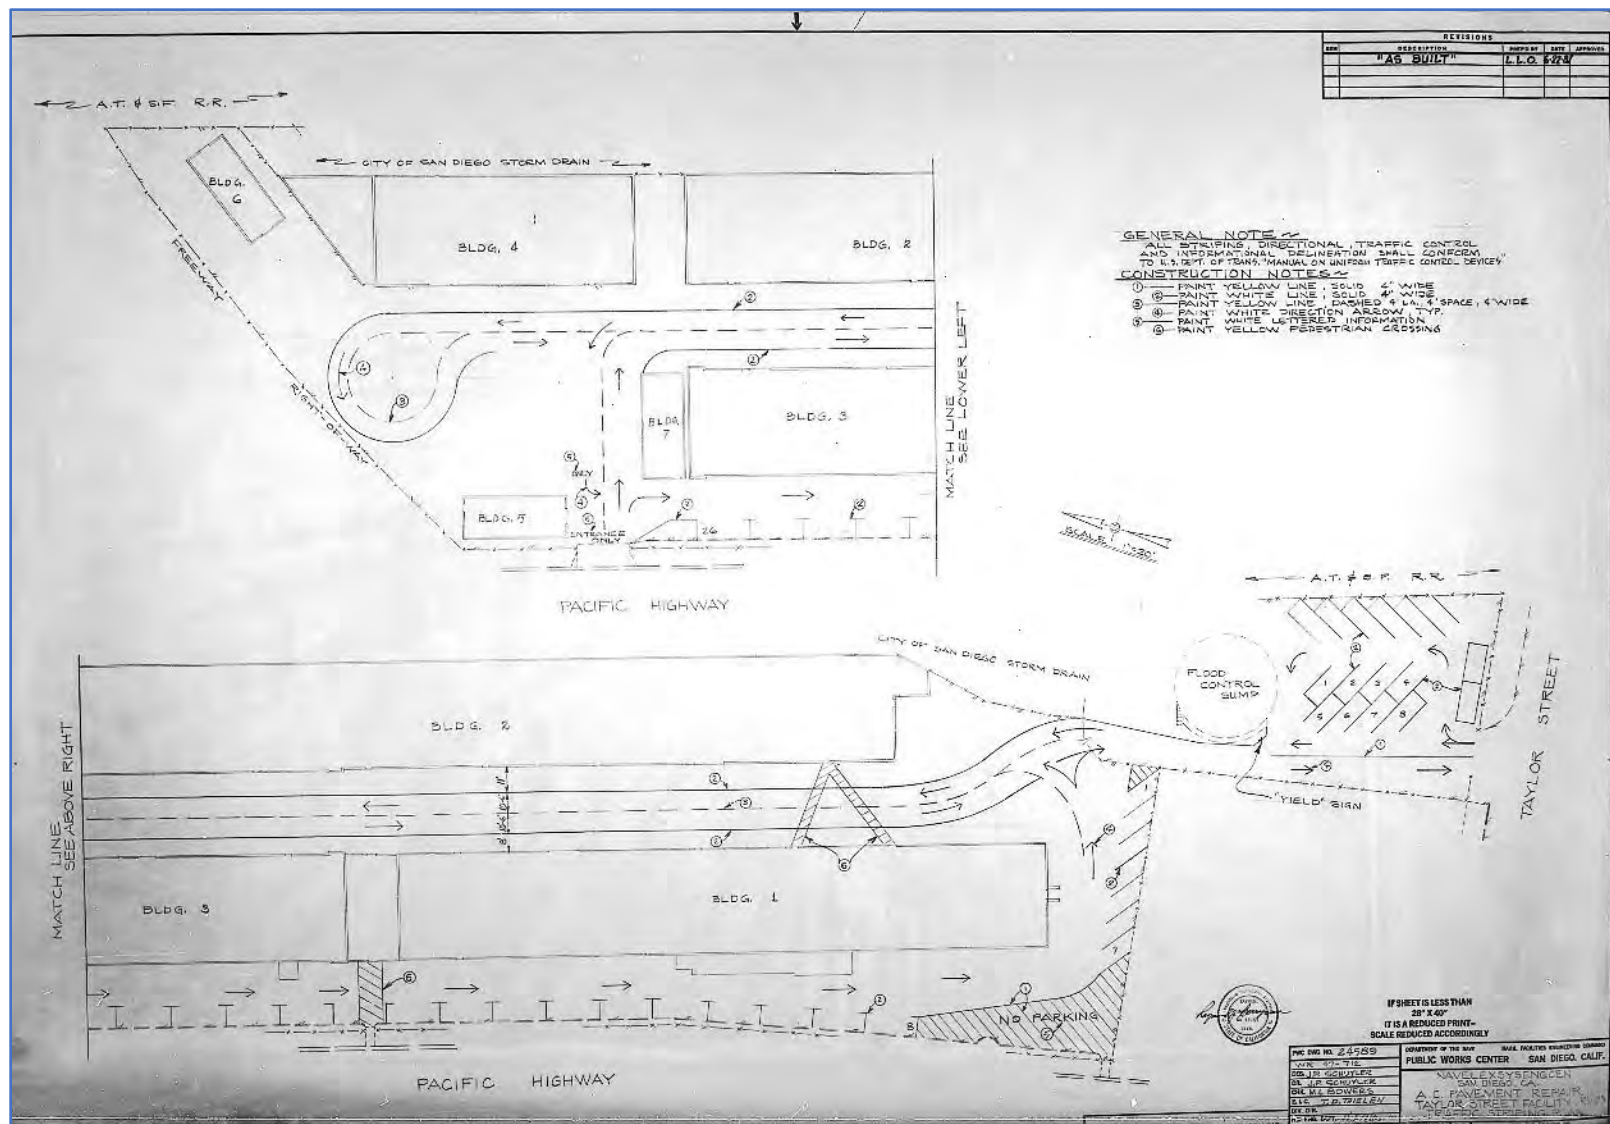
Taylor Street Complex, Pavement Repair Traffic Striping Plan, 1979
